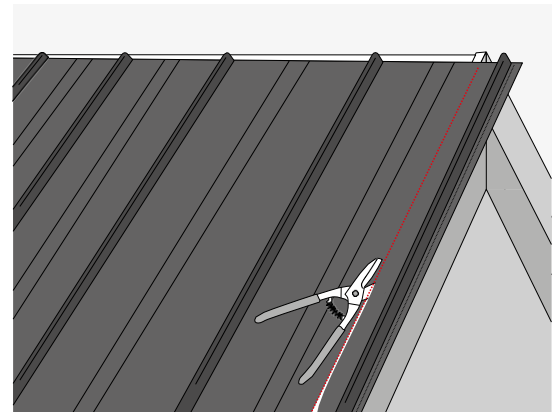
CUTTING THE PANELS AT THE BUILDING GABLE
